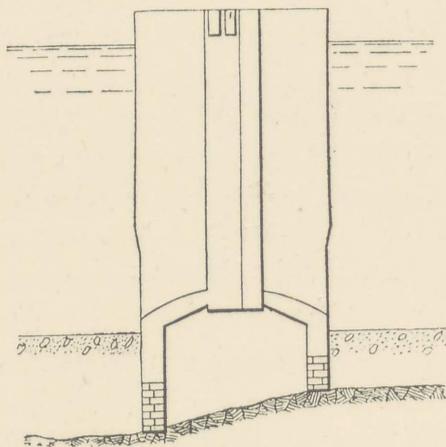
Saltash Bridge Circular Caisson, 37 ft. diameter.
